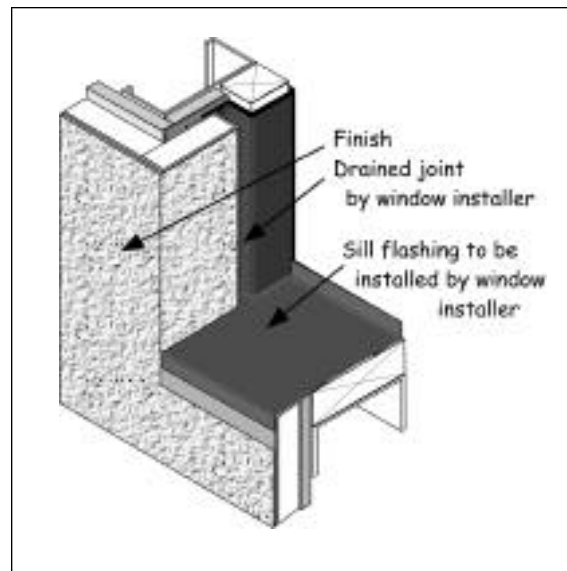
The EIFS installation is complete. The window installer will set a metal sill flashing into parallel ribbons of sealant running from the back dam to the face to allow drainage. The window is installed over the pan flashing.
